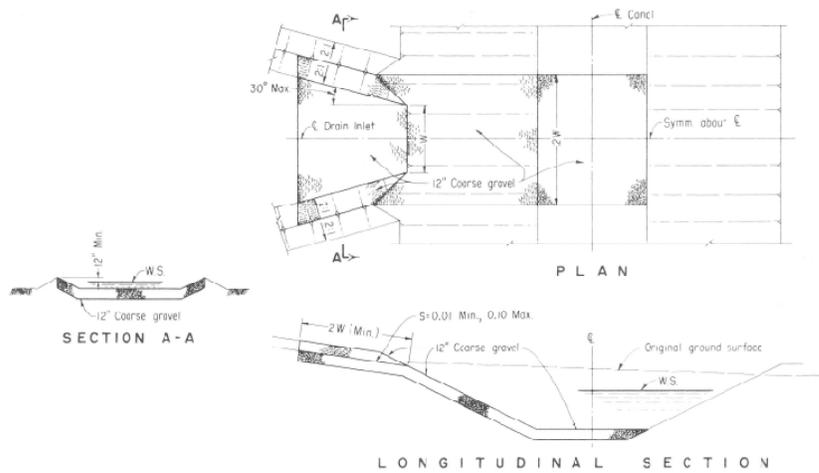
Drain inlet—plan and sections. 103-D-1312
